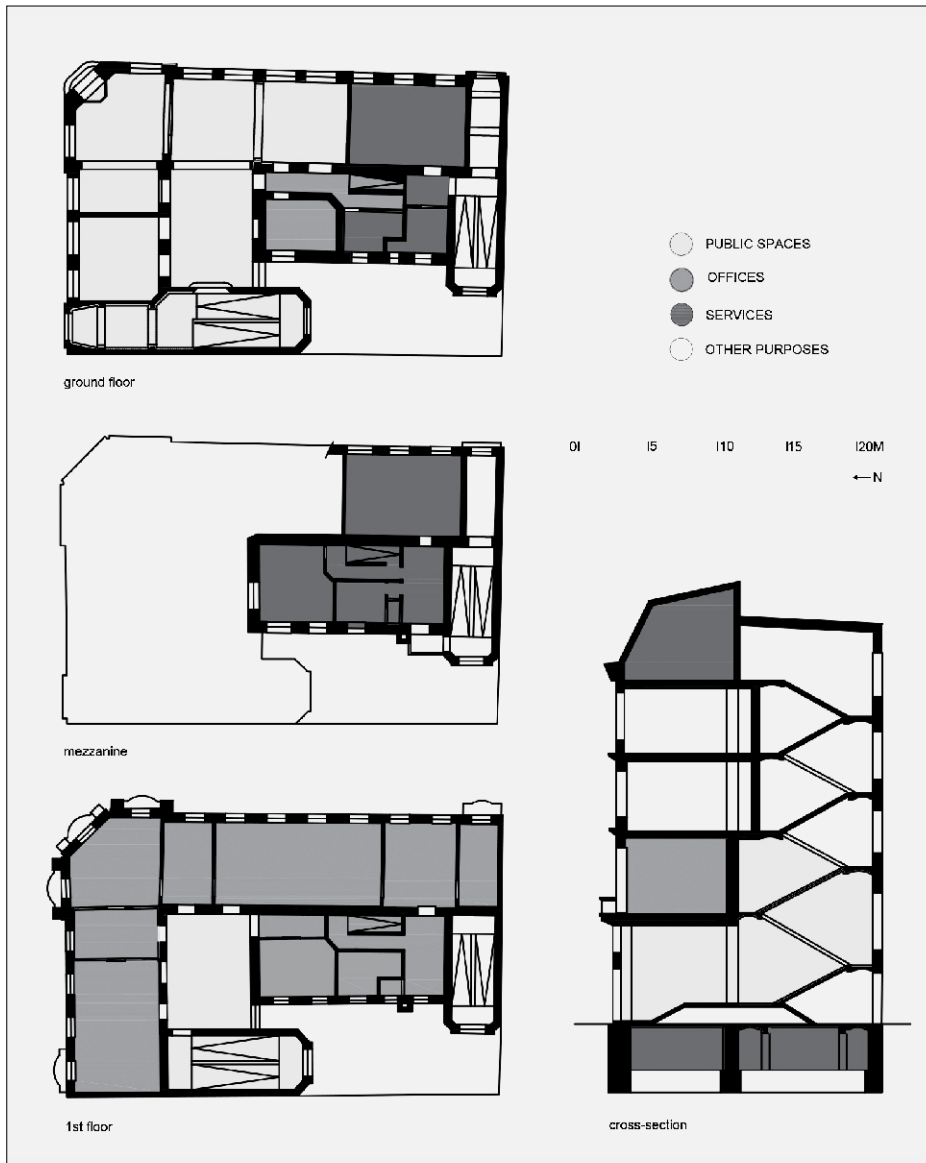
THE LAYOUT OF THE MAIN FUNCTIONAL ZONES OF THE BUILDING – GROUND FLOOR, MEZZANINE, FIRST FLOOR AND CROSS SECTION
